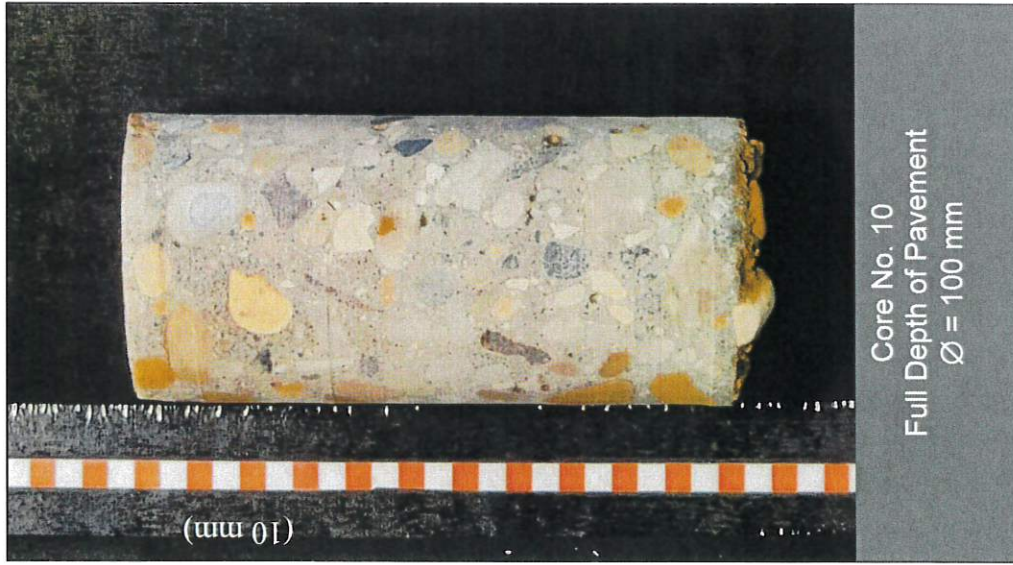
Specimen from Wellington Crescent, East Curb Lane
